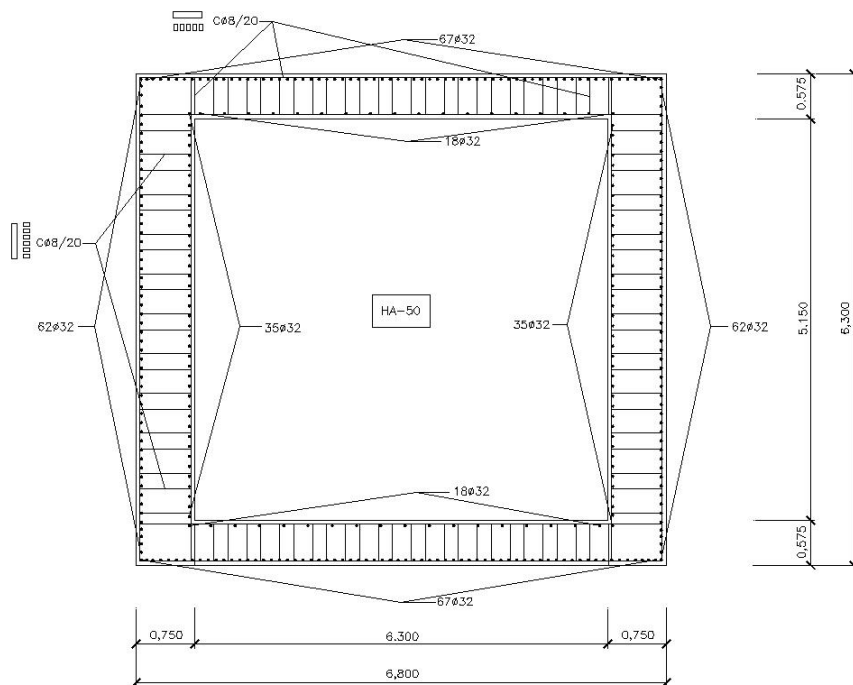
Bottom cross-section for the 50 m span viaduct and 100 m pier height
